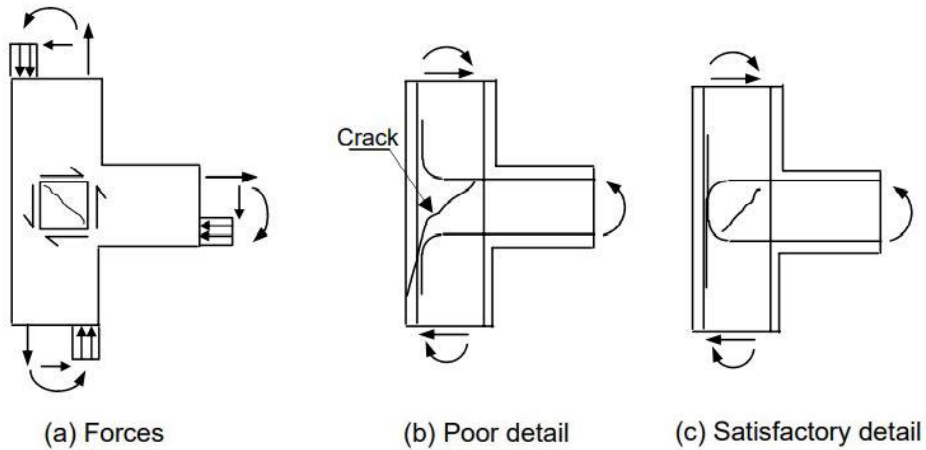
Forces acting on exterior joints (Uma and Prasad 2006; Jahan 2016)
